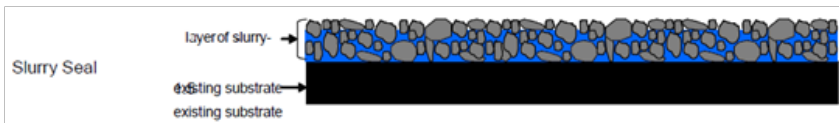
Slurry type seal coating's cross-section (SANRAL 2007)
